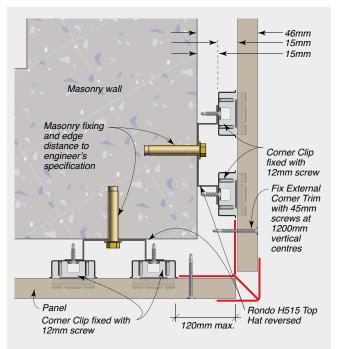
Typical Internal Corner Detail - Elevation
